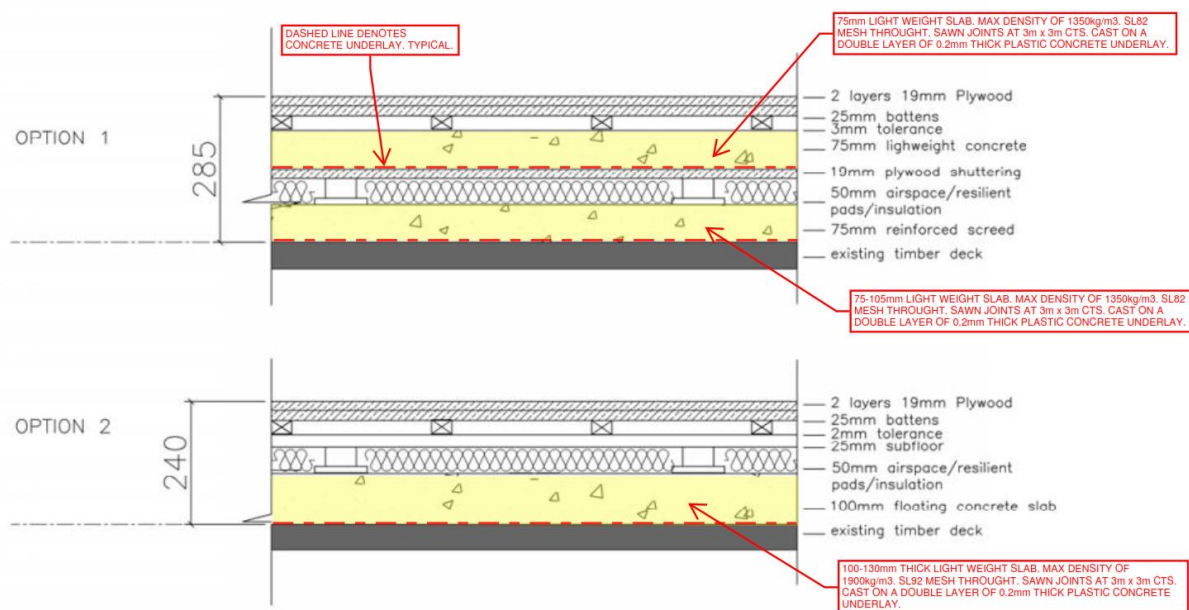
Typical detail of acoustic floor. Sketch provided by TTW. Showing separation from the old structure and removable floor treatments.
